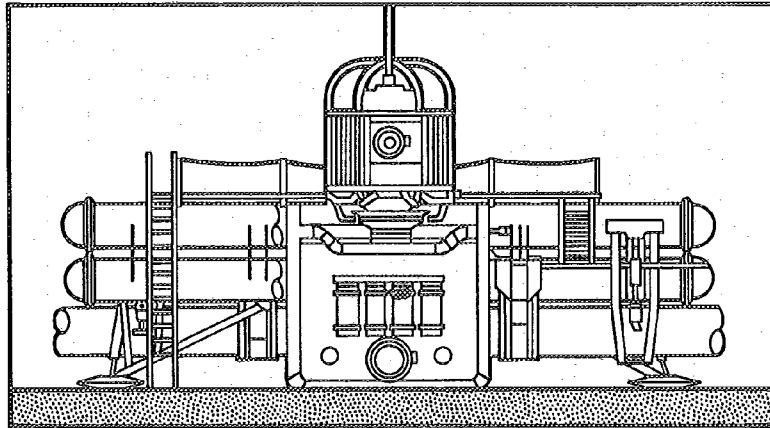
60-ton alignment frame and welding habitat with dry transfer
